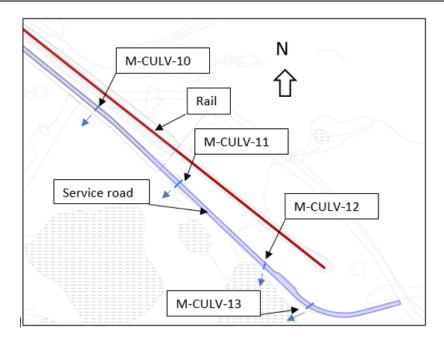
Rail Service & Access Road - Cross Drainage Culverts
